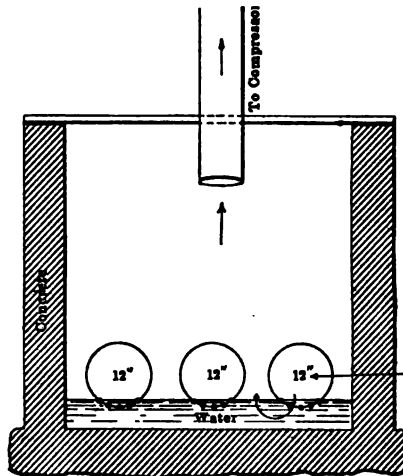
CONCRETE BOX FOR WASHING AIR.
